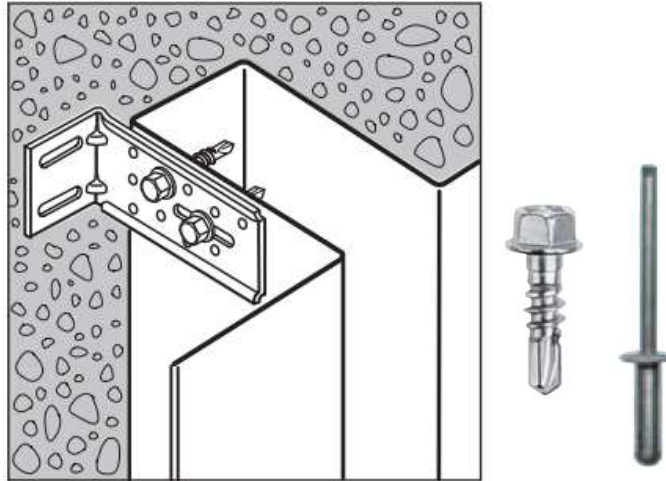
Fixing the galvanised steel profiles to the brackets
